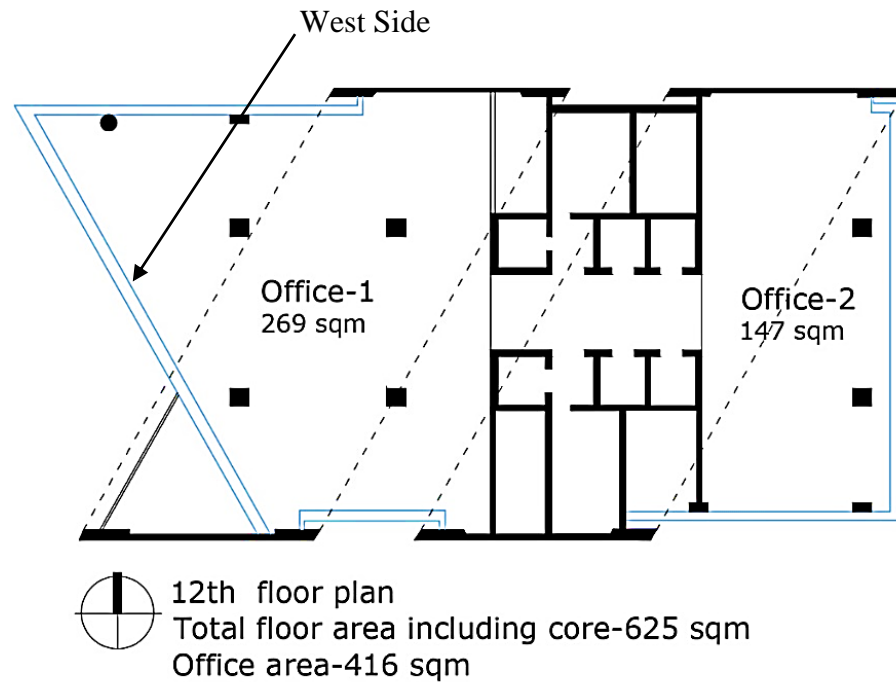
Rangs RD square 12th floor plan (Source: dotbangladesh.com)
